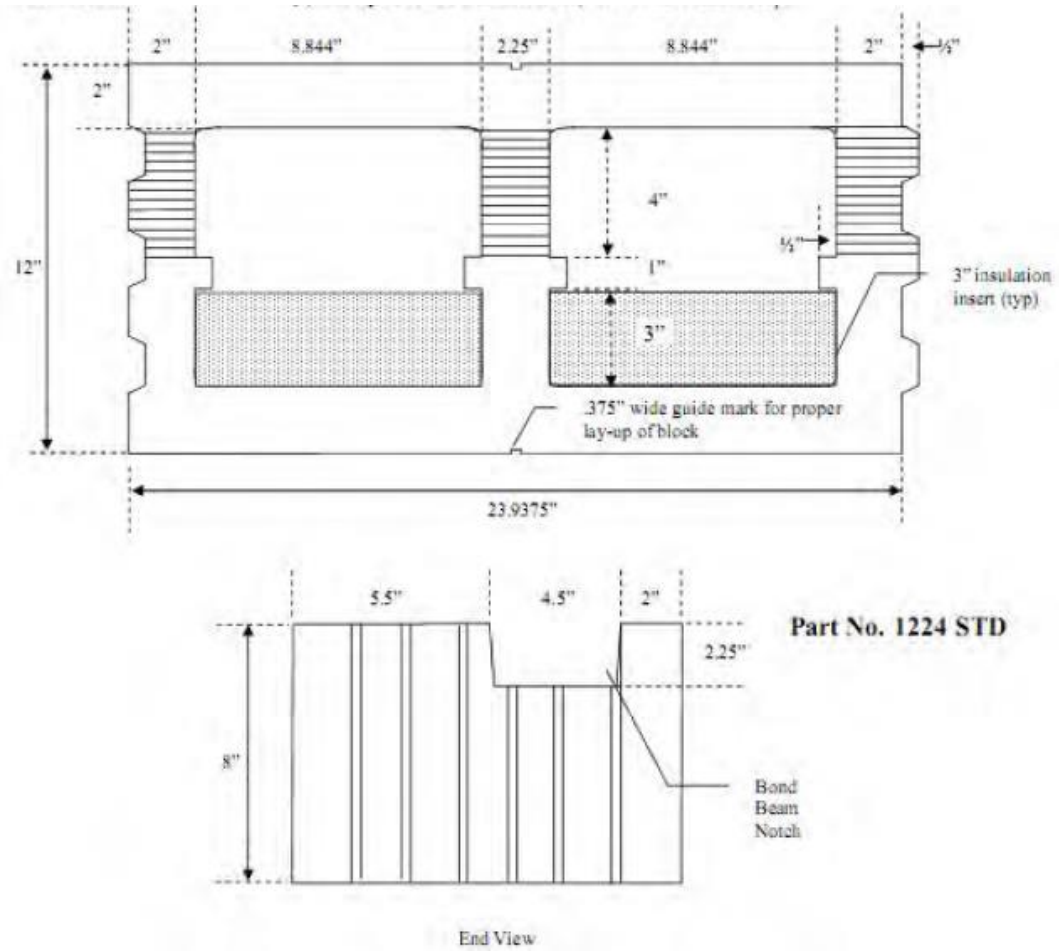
Standard Faswall wall form detail. Image from ShelterWorks, LTD (2010).
